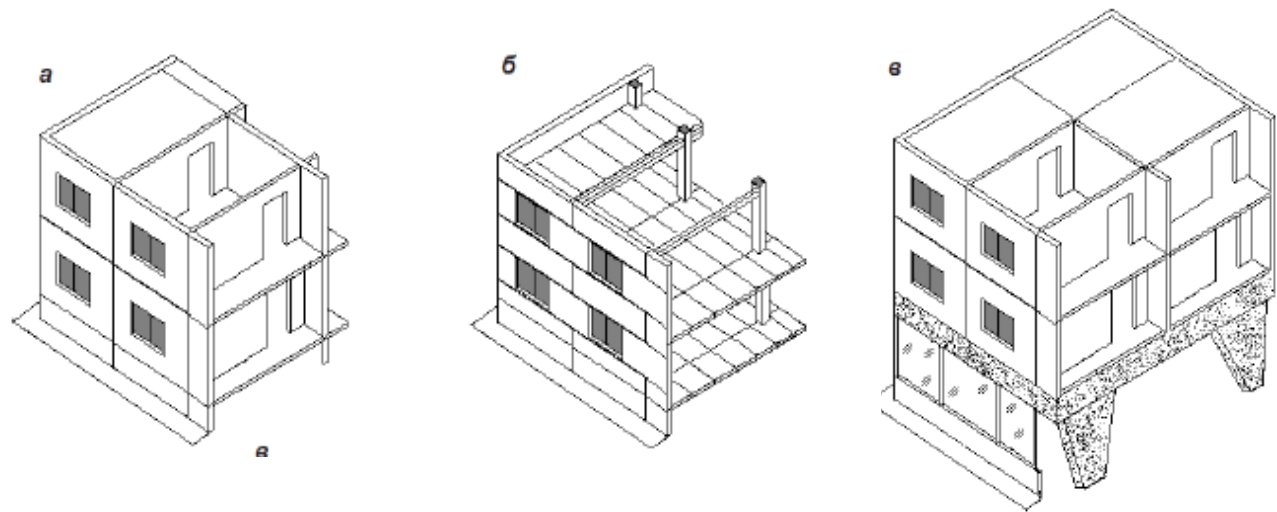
, Standardized concrete panel buildings - structural schemes: a) frameless; b) frame-panel; c) mixed.
